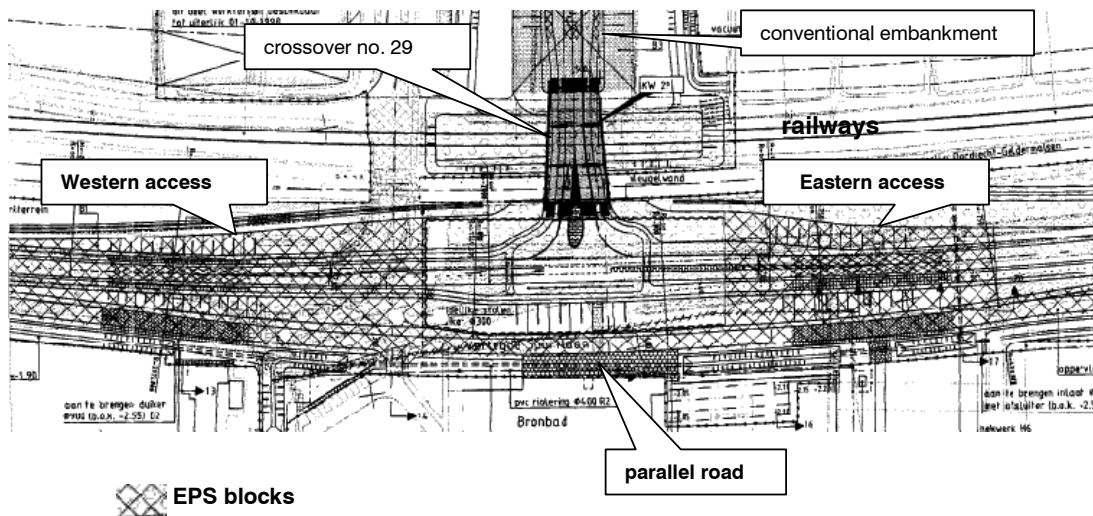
Situation drawing of approach roads to the viaduct (structural work number 29) over the Betuweroute railway
